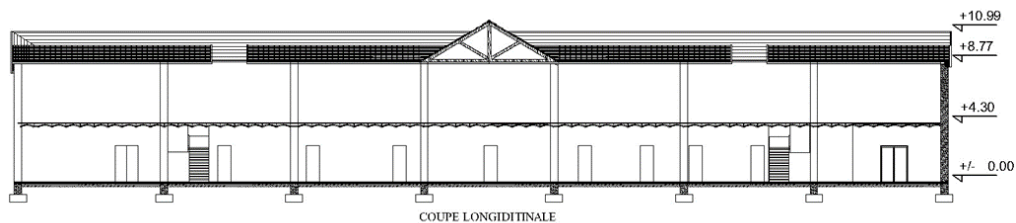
Longitudinal section of the central block. Source: Design office Bouras
